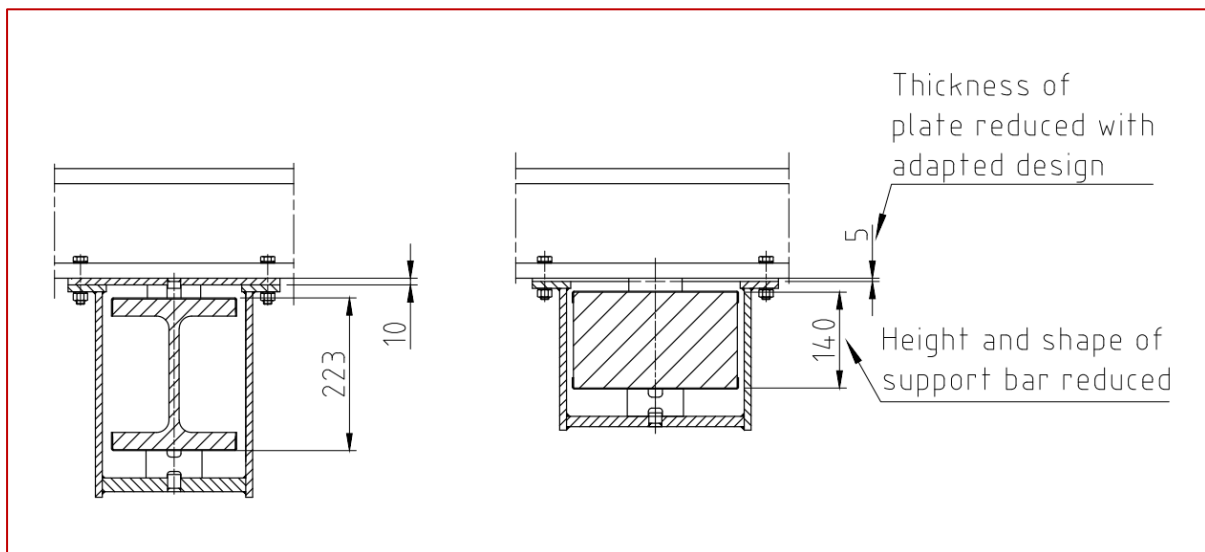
Sections through a standard I-beam support bar (at center beam connection), and through a rectangular support bar as specially developed for this project
